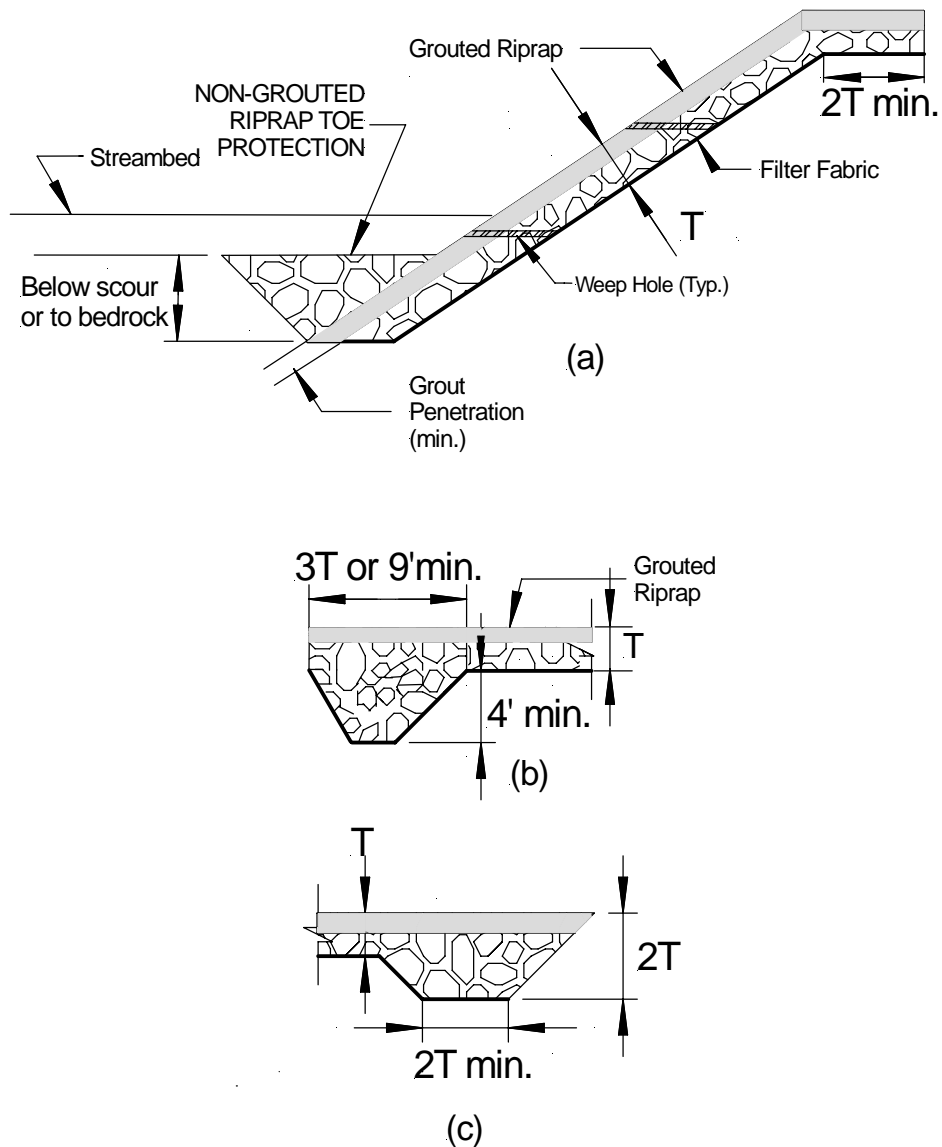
Grouted Riprap Sections: (a) section; (b) Upstream Detail; and (c) Downstream Detail
